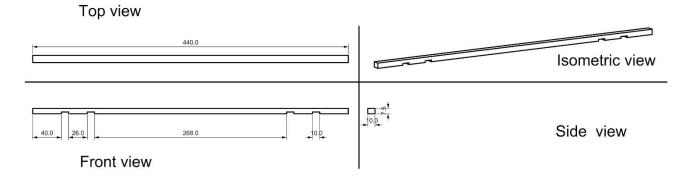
Roof rafter beam Orthogonal projections in cm
